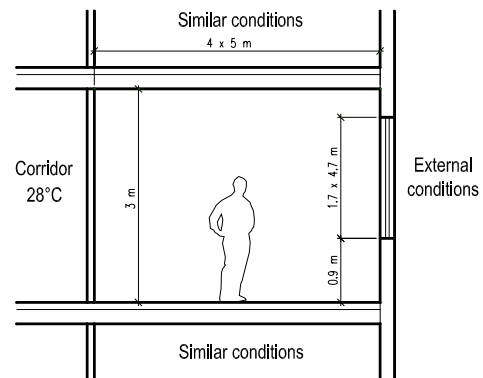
Cross section of the single façade room with middle heavy external wall (case FM)
